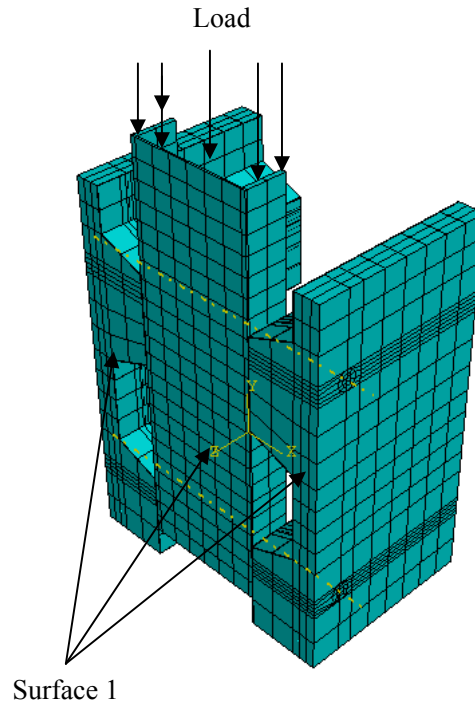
Finite Element Model of Push Test Specimen for Profiled Slab
